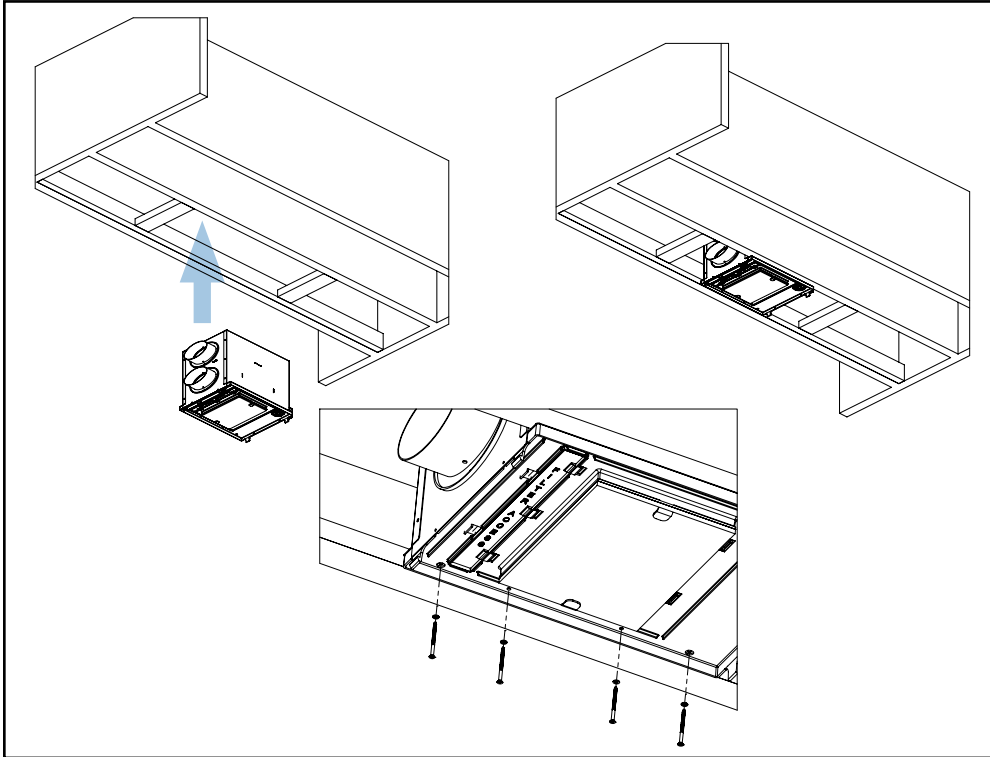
UNIT MOUNTED BETWEEN CEILING JOISTS
